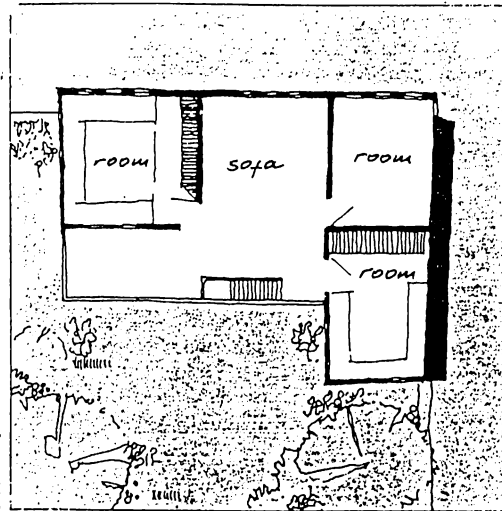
An example of a plan a traditional Turkish house. (Source: Küçükerman, 1988)
